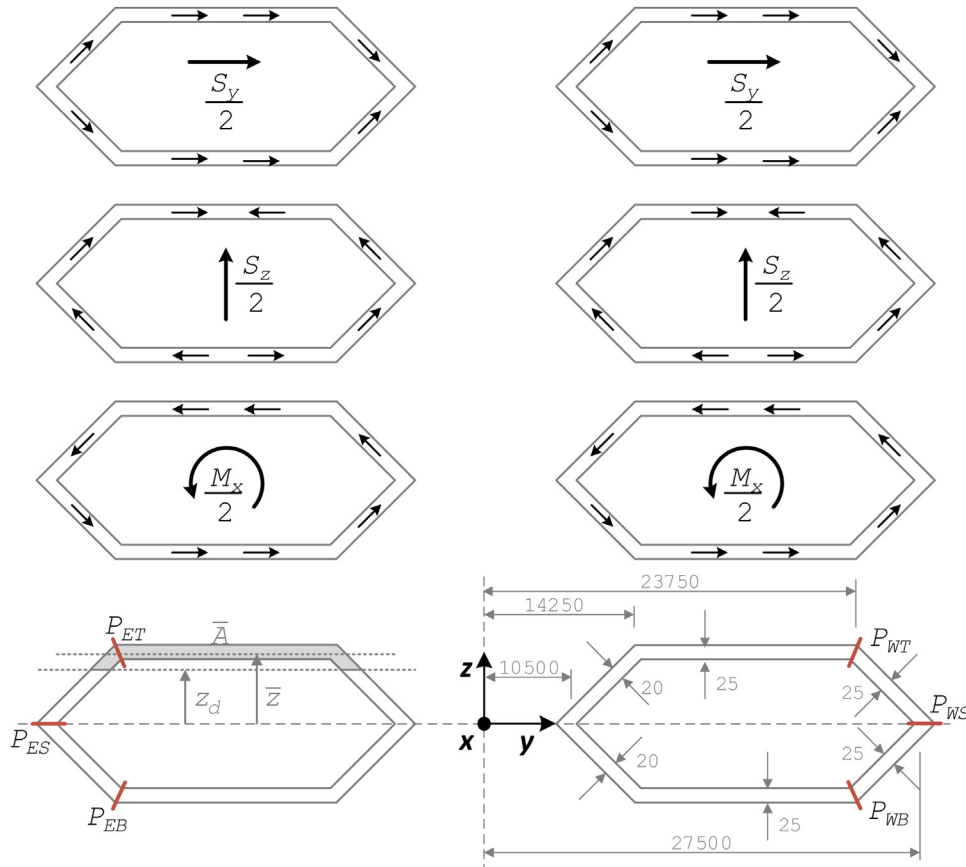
Bridge girder cross-section with critical points and assumed stress distribution for calculating cross-sectional stresses. All measurements are in mm.
